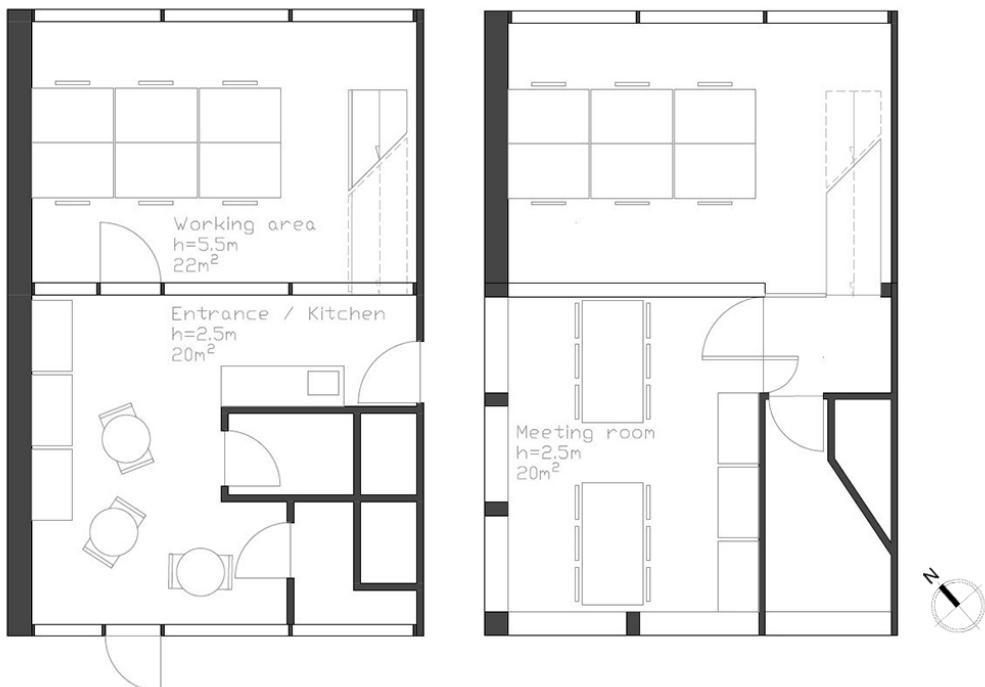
Office drawings. Ground floor (Left) and first floor (Right)
